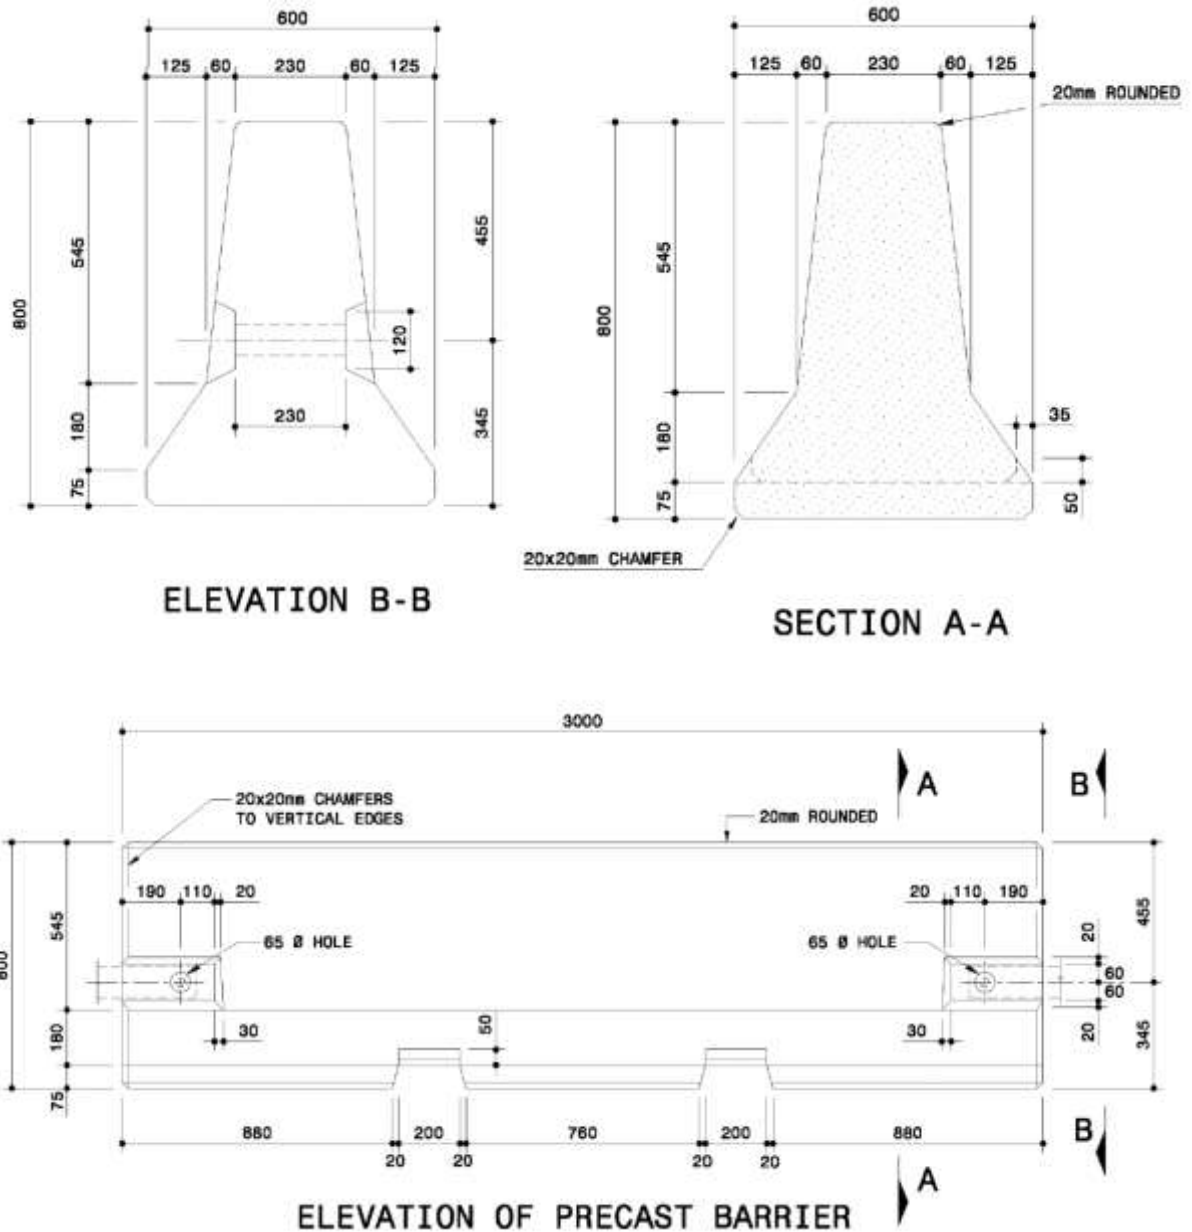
F-shape Precast Concrete Barriers (800 mm High Module)
